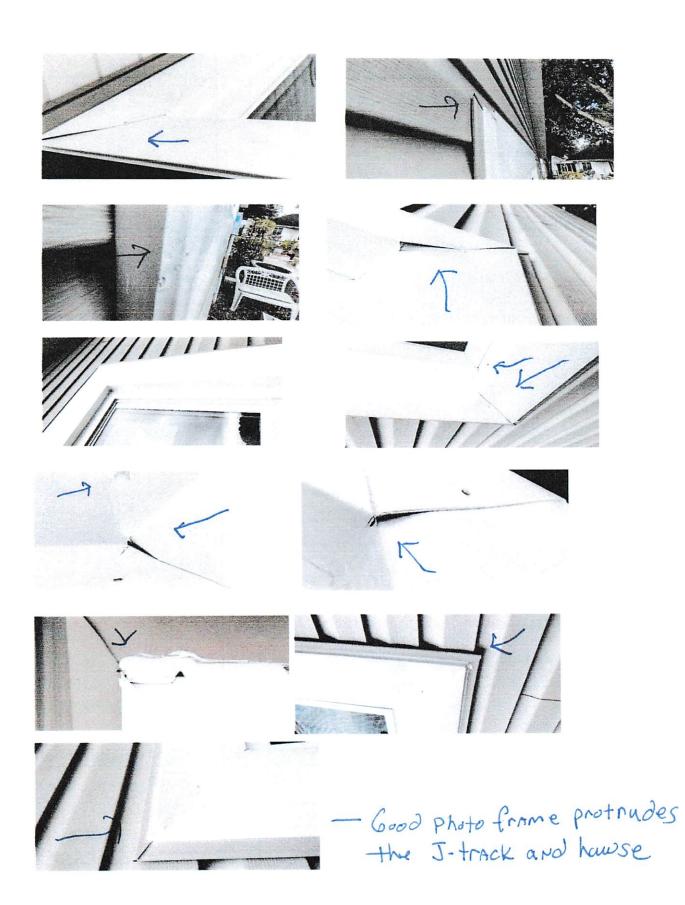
TH VISIT, PHOTO I SHOWS THAT THERE WAS INSULATION IN WINDOWS AND THEY REMOVED IT. 2ND PHOTO SHOWS IMPROPER INSTALL OF BUCKING. CUT SHORT TO BUT AGAINST THE SCREWS IN WINDOW FRAME. THEY REFUSED TO PULL WINDOWS AND PROPERLY INSTALL BACKING AND PROVIDE PROPER SCREW PLACEMENT FOR STRENGTH IN ACCORDANCE WITH PRODUCT APPROVAL CODE. REMAINING PHOTOS CLEARLY SHOW SUBPAR WORKMANSHIP.
